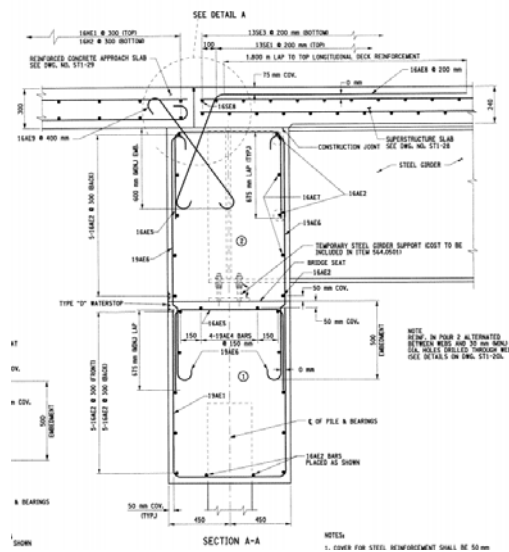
Abutment detail of Arthur Road Bridge over I-87 S.B.
